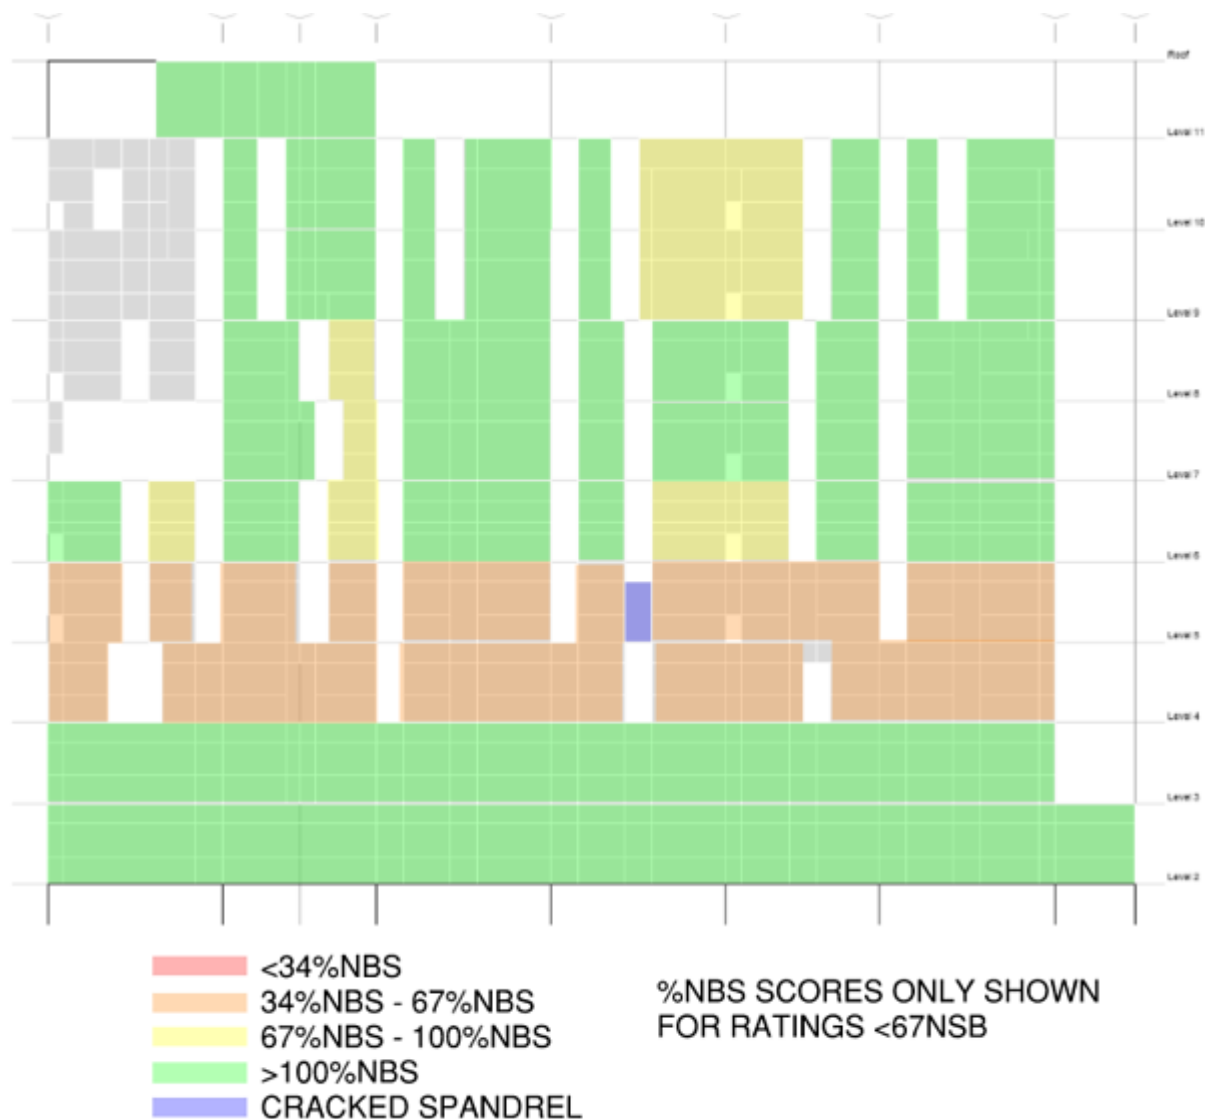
, Critical Longitudinal Direction Wall – South Structure
